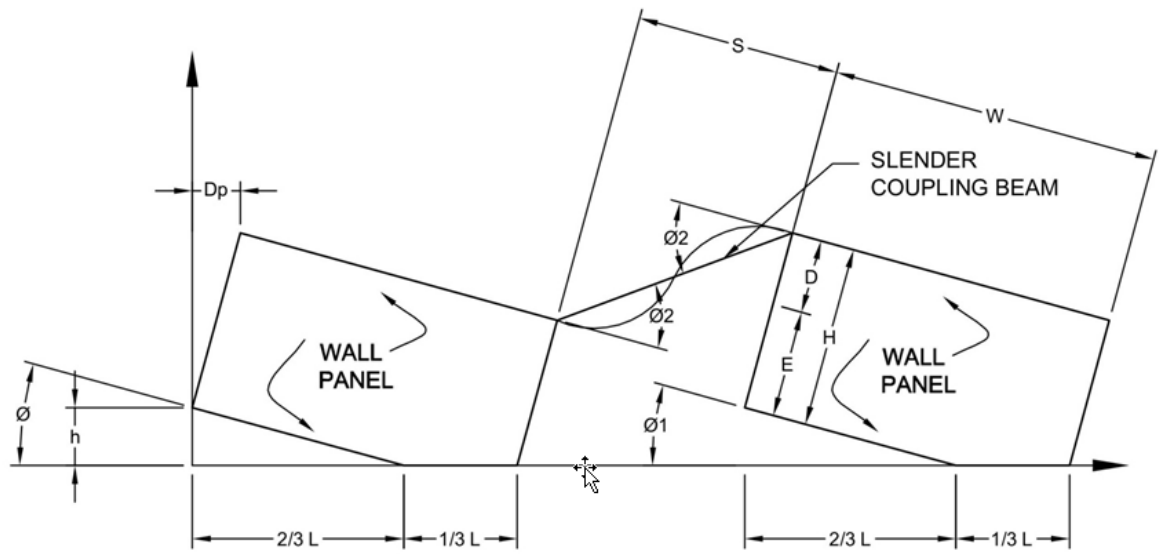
Deformed Configuration of a Single Storey Building with Slender Beams
